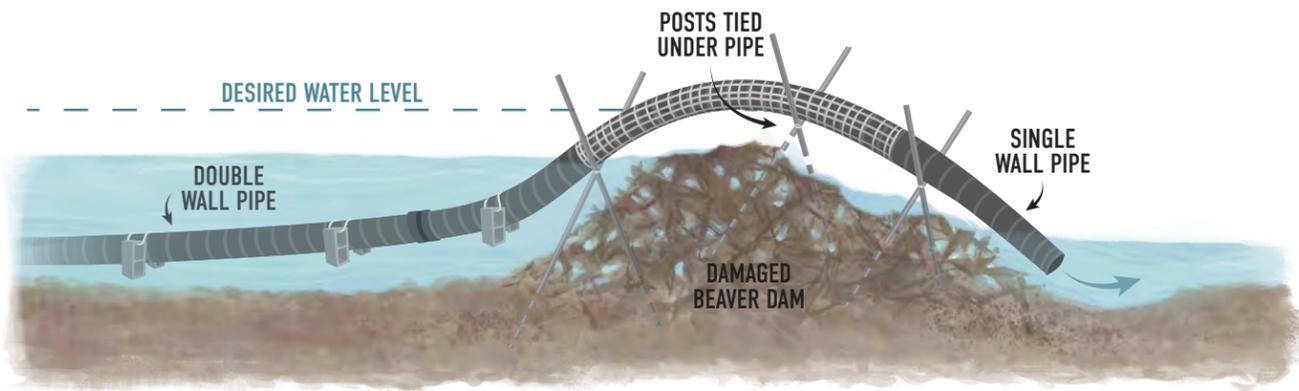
Installing or adjusting pond leveler to account for dam damage.
